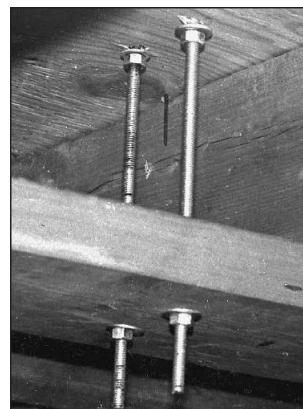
The strengthened anchoring for the roof-mounted tower. Bolts run through the roof and through the anchor plate (2×6) between joists. (Photo by Jane Wolfert)
